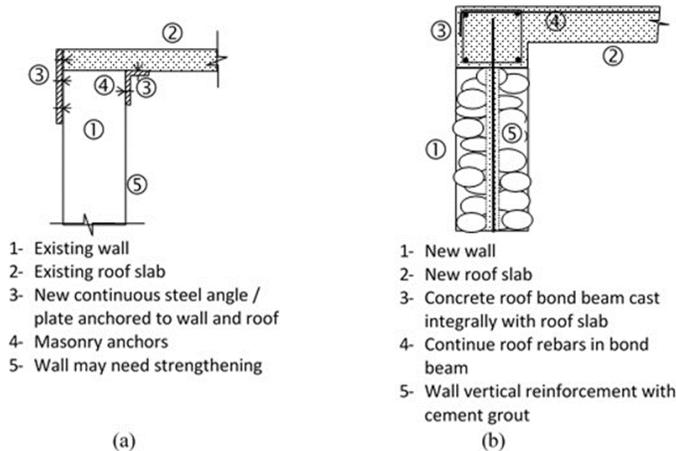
Improving connectivity of roof with walls. (a) Existing construction, (b) New construction
